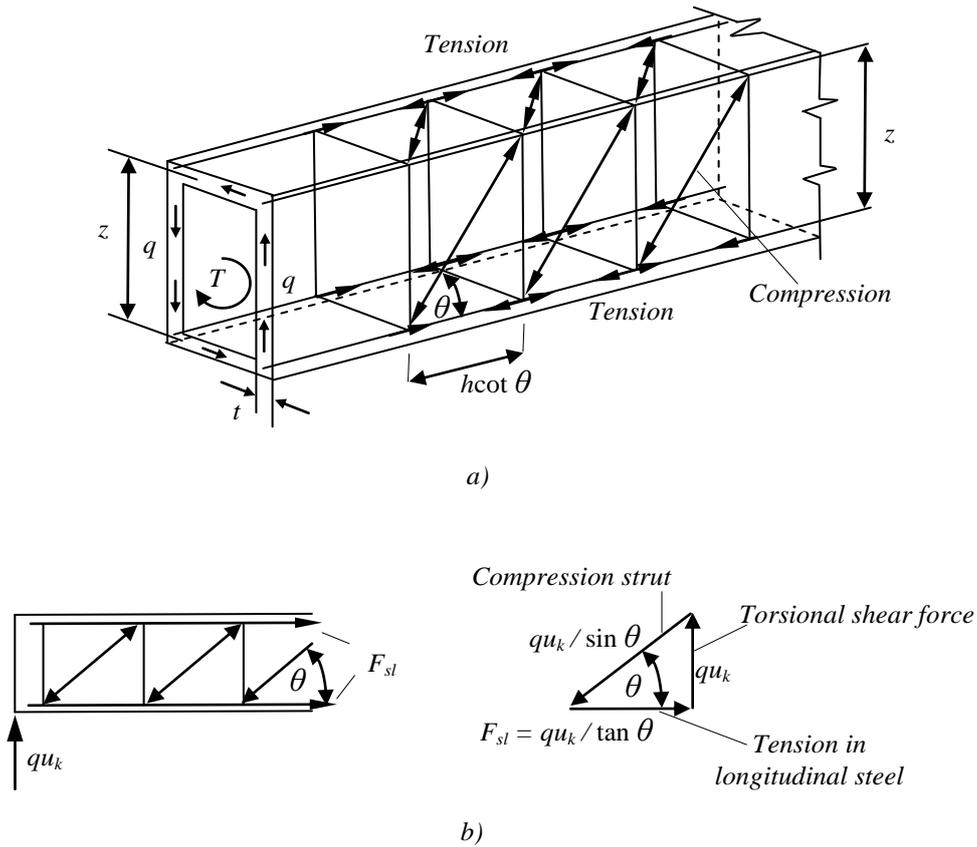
Structural model of a reinforced concrete member subjected to torsion, a) overview of truss model, b) forces acting on the body (one face shown representative of all four faces). The figure is based on Mosley et al. (2007).
